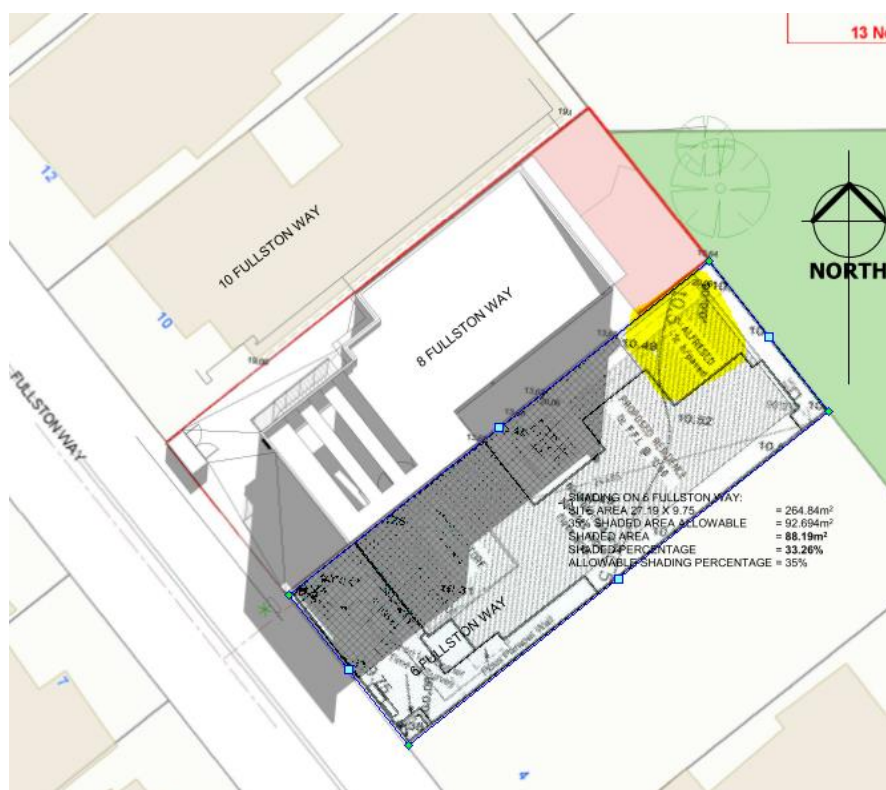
Existing building footprint of adjoining dwelling and the extend of shade case by the proposed dwelling.
